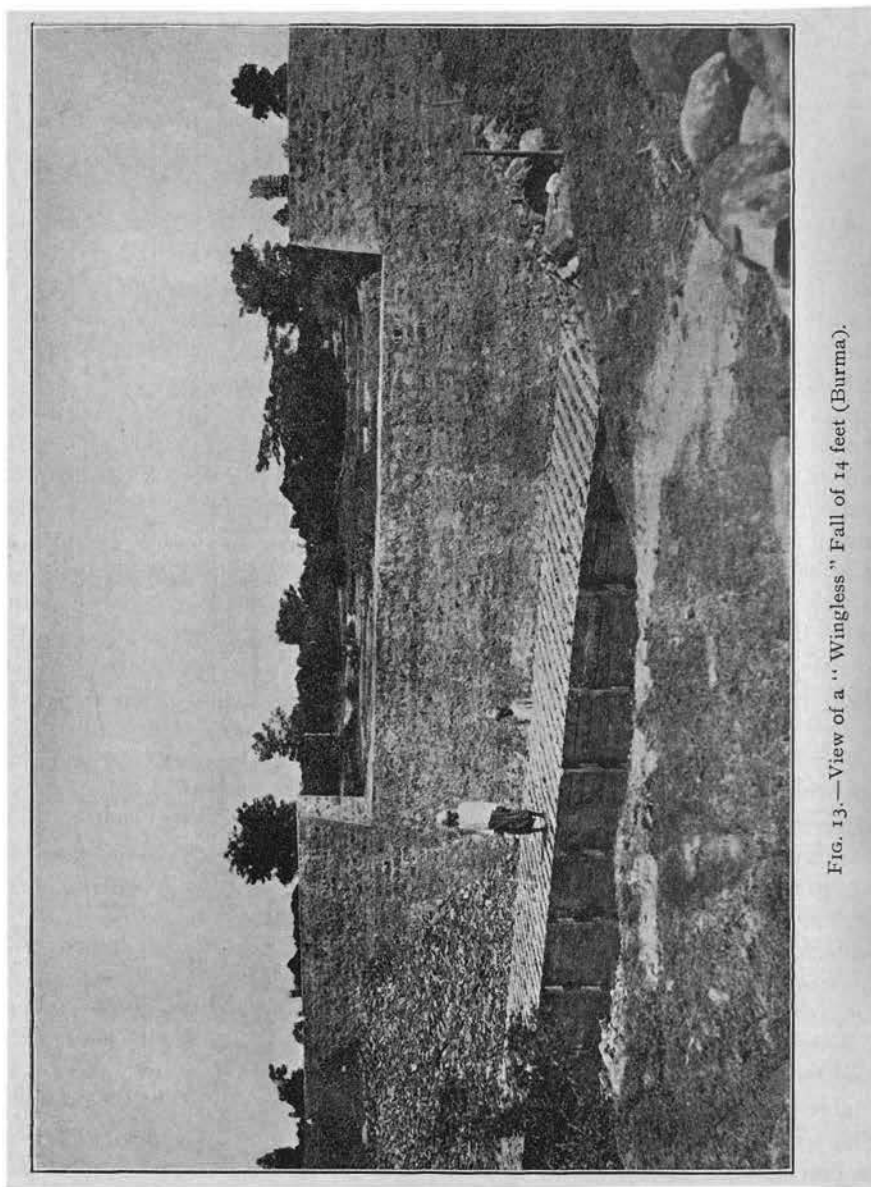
View of a "Wingless" Fall of 14 feet (Burma).
